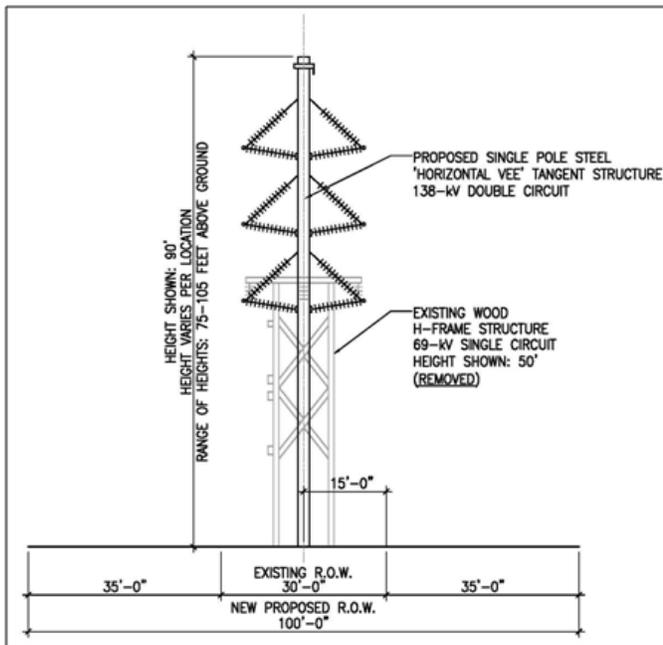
Typical Profile of New Single Steel Structures on Existing but Expanded ROW.
